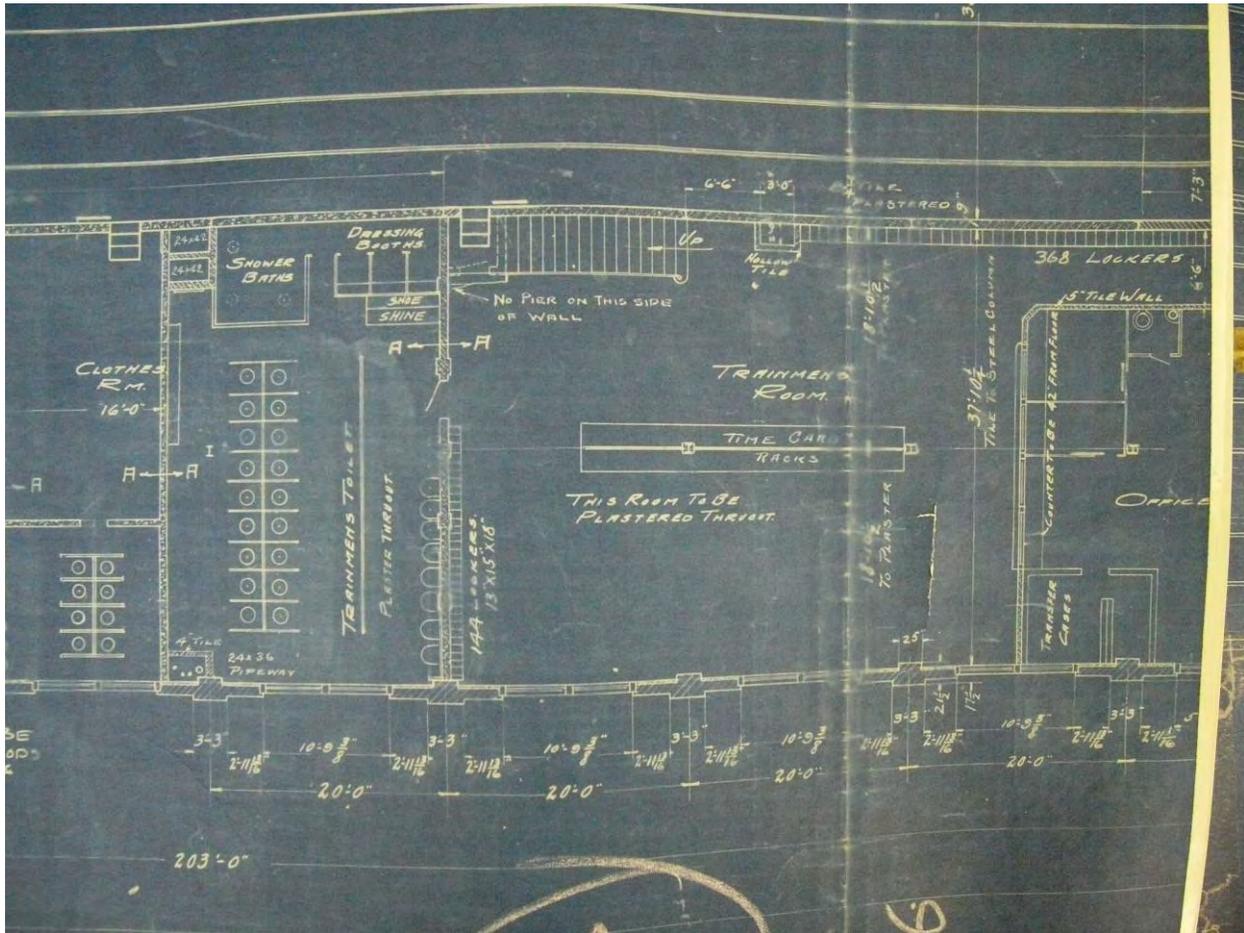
First floor plans, middle portion, source: Northwest Architectural Archives
